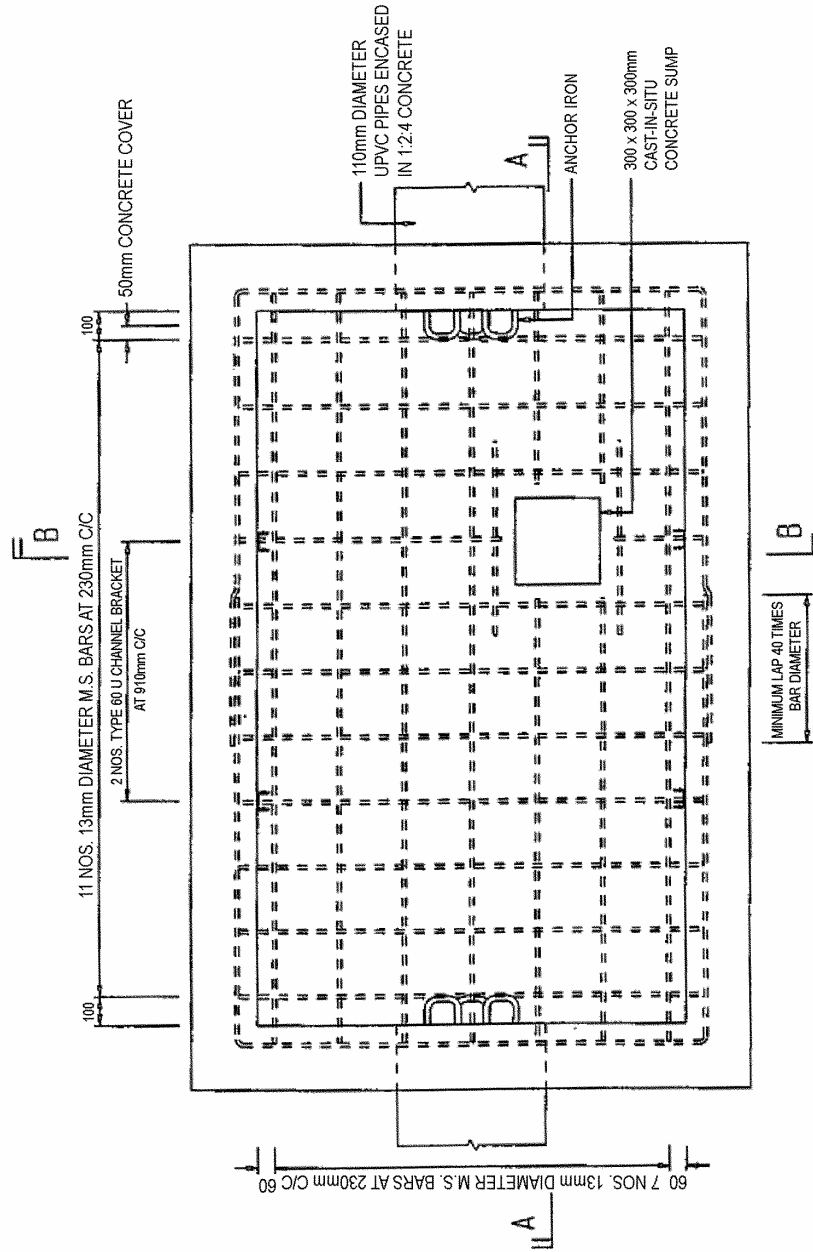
MANHOLE DRAWINGS - TYPE MX4
